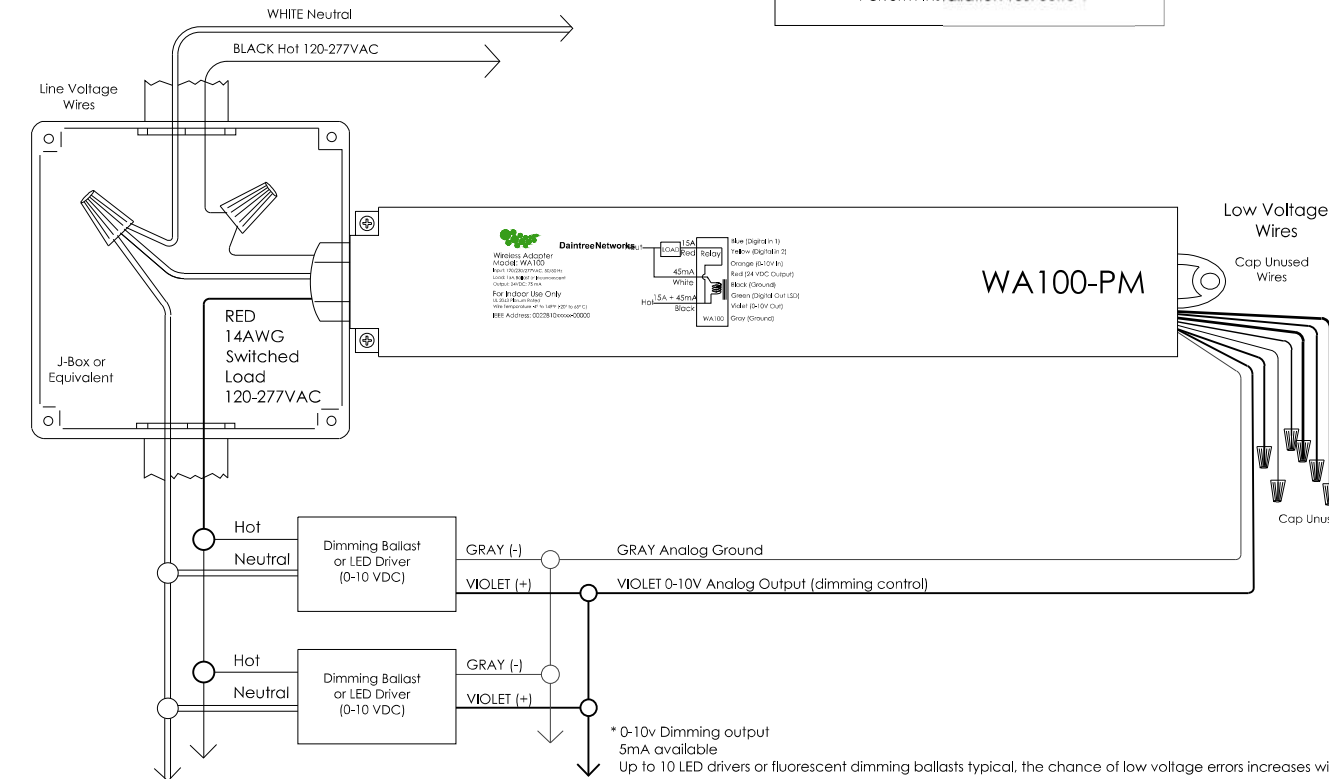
Dimming Light Fixture(s), Photosensor configuration
